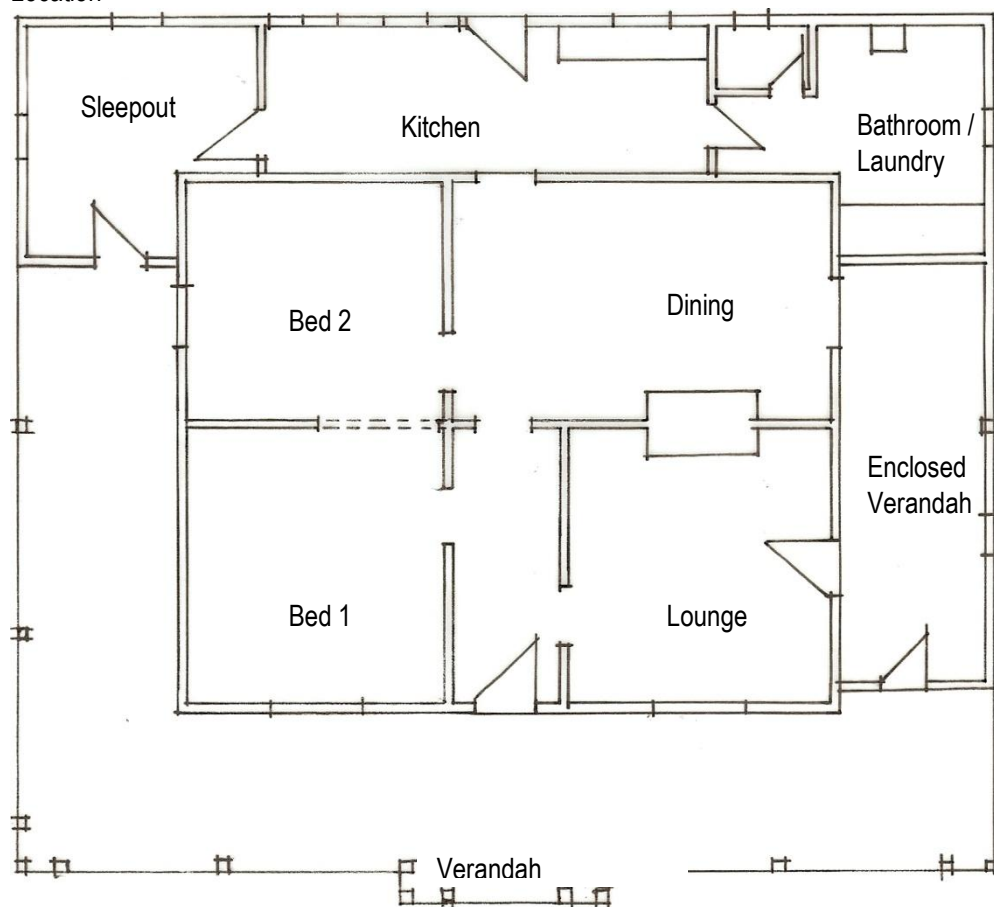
Floor Plan - the place as a whole is of little significance and contains items of some significance
